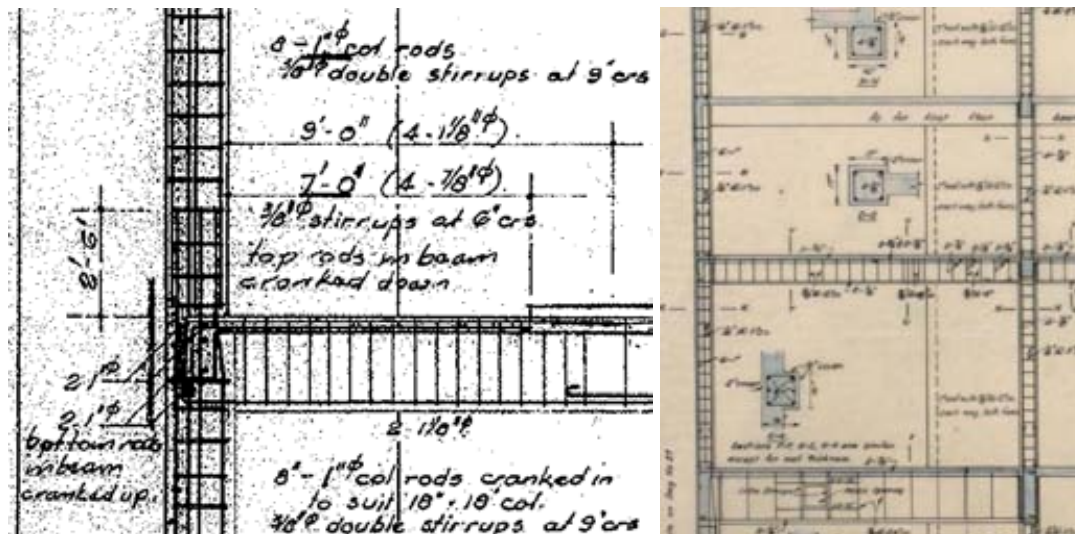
Examples column lap-splice details in pre-1970s RC buildings in New Zealand.
